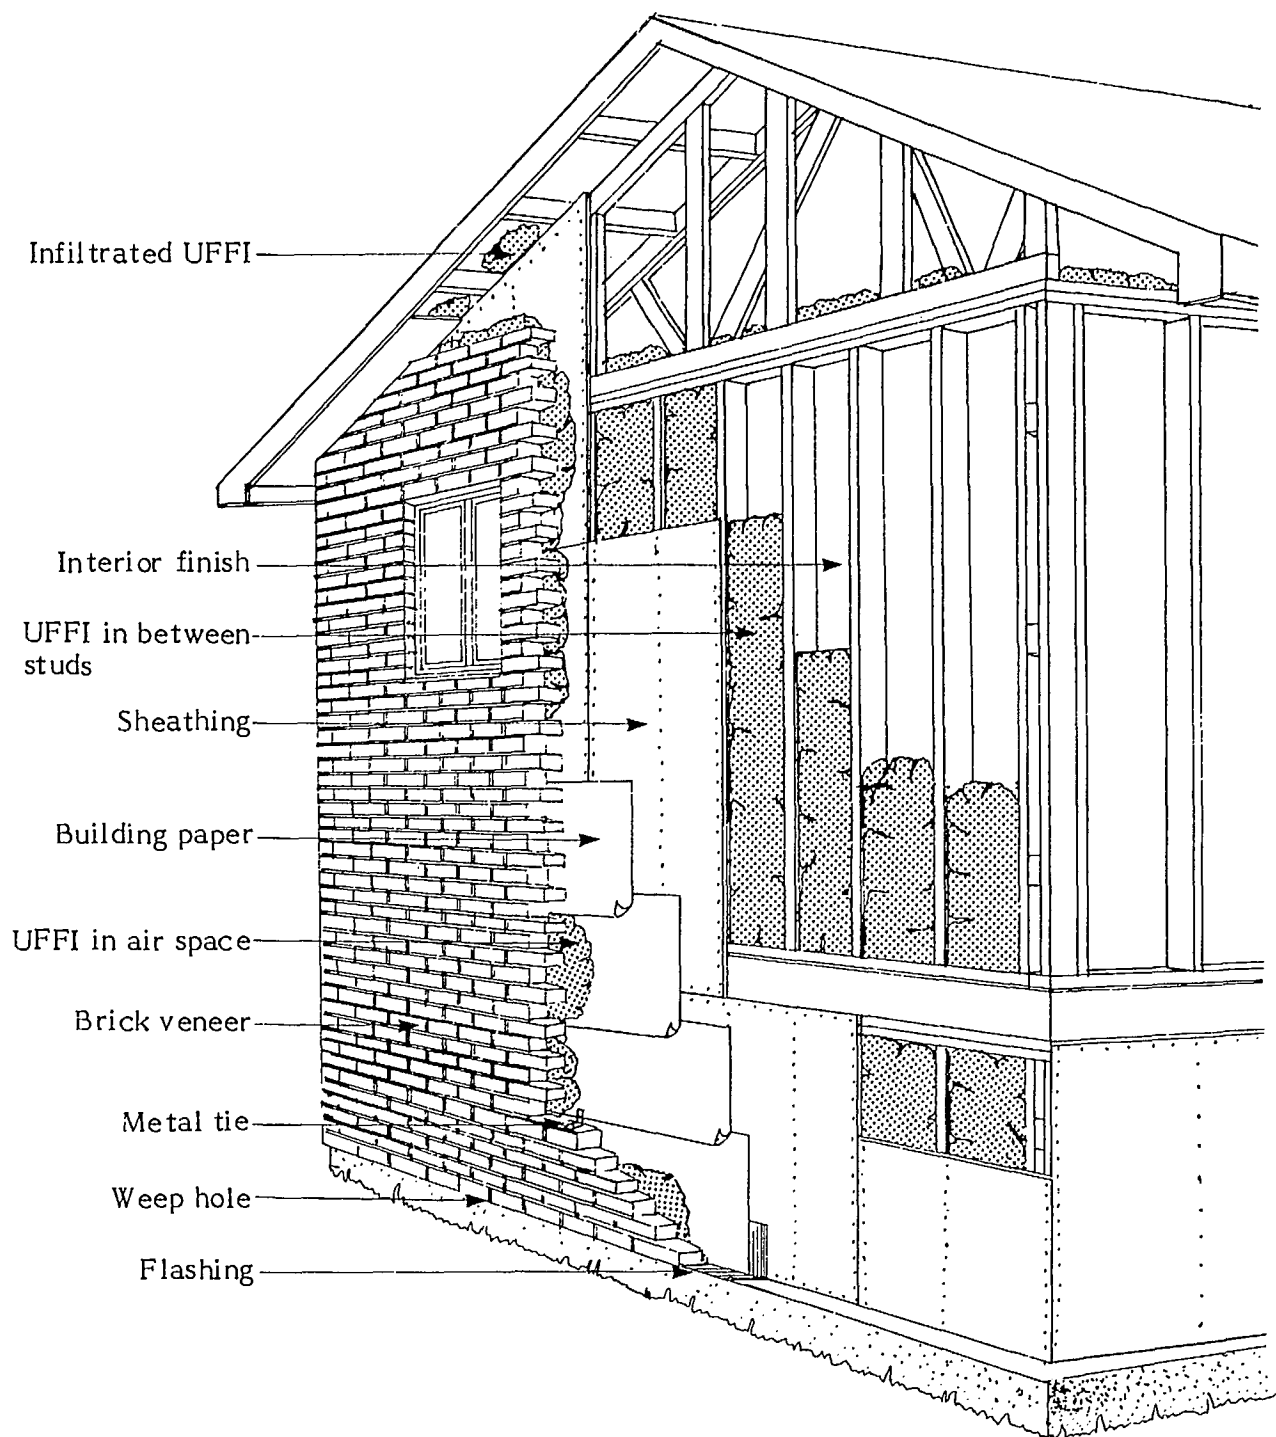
DISMANTLING OF BRICK VENEER WALL
